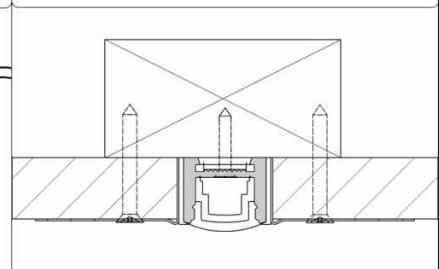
ENSURE EXTRUSION IS MOUNTED SECURELY
